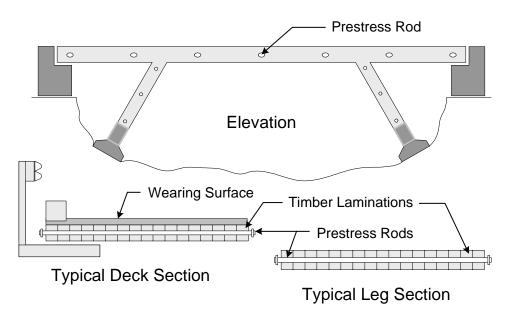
Stress-Laminated Timber K-frame Bridge
